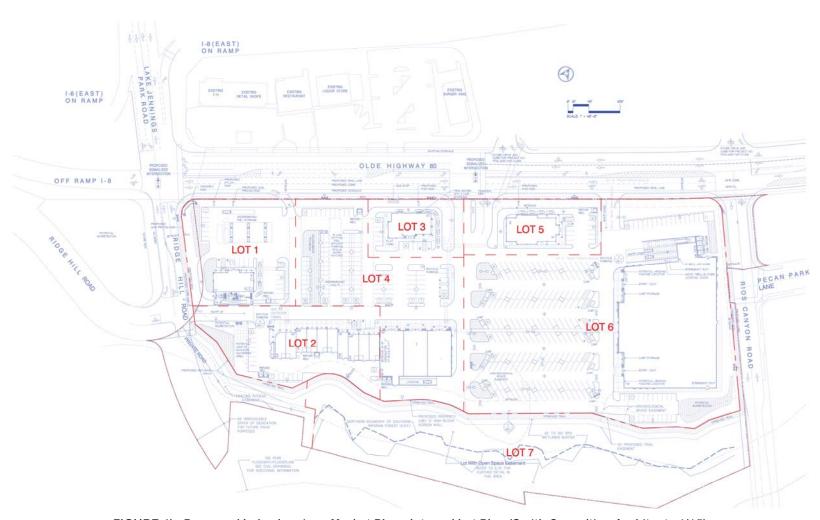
Proposed Lake Jennings Market Place Internal Lot Plan (Smith Consulting Architects 1/15)
